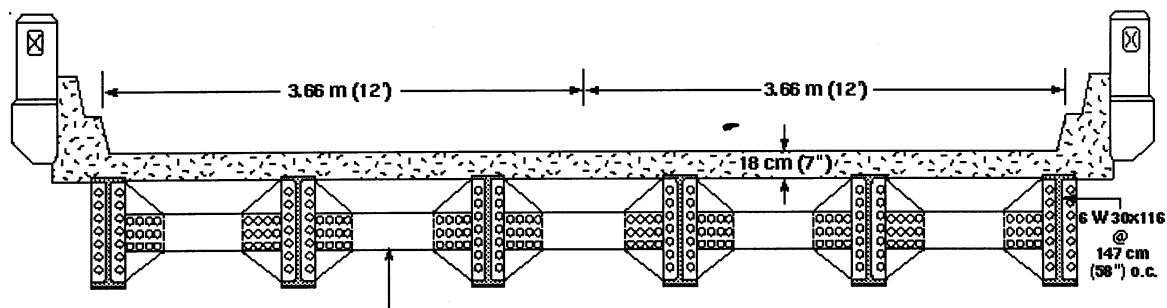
Cross-Section of Alamosa Canyon Bridge Span
